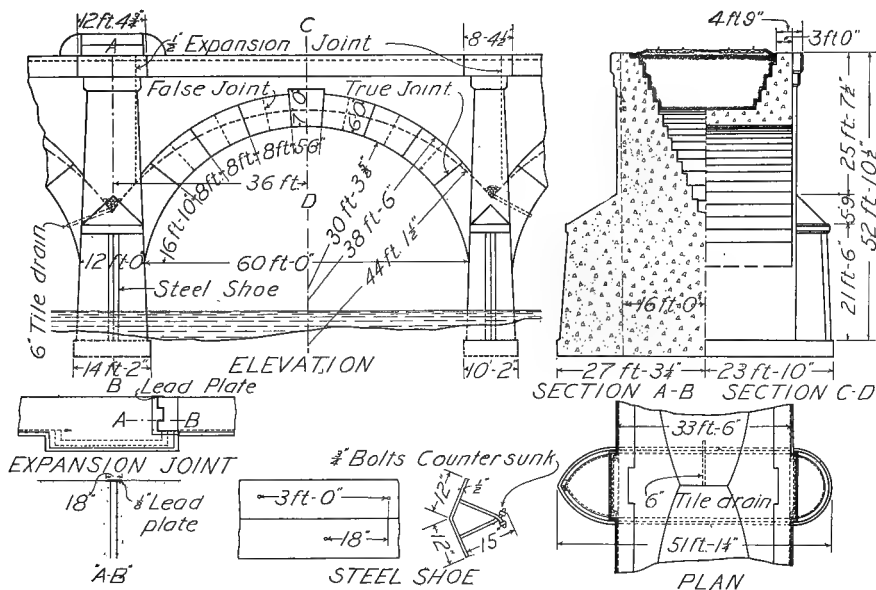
DETAILS OF 60-FT. ARCH, WALLKILL RIVER VIADUCT.
